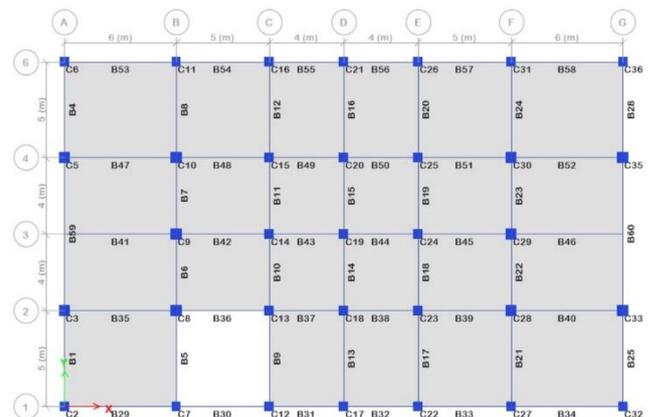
2D plan view of RCC Model 1 AT Storey 2
